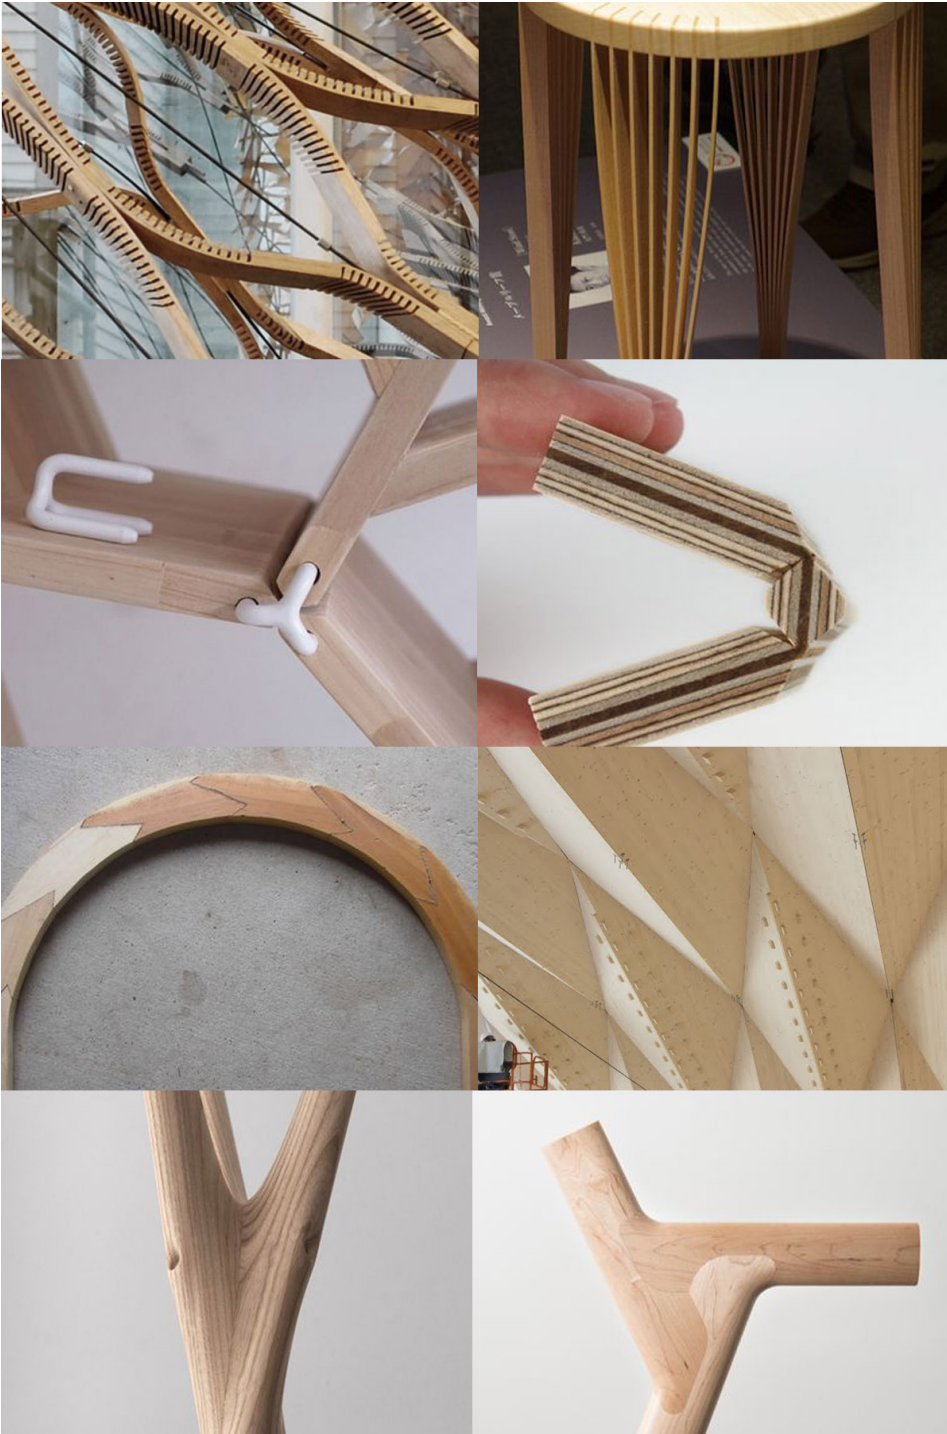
Various joint detailing and fabrication techniques applicable to structural timber.
